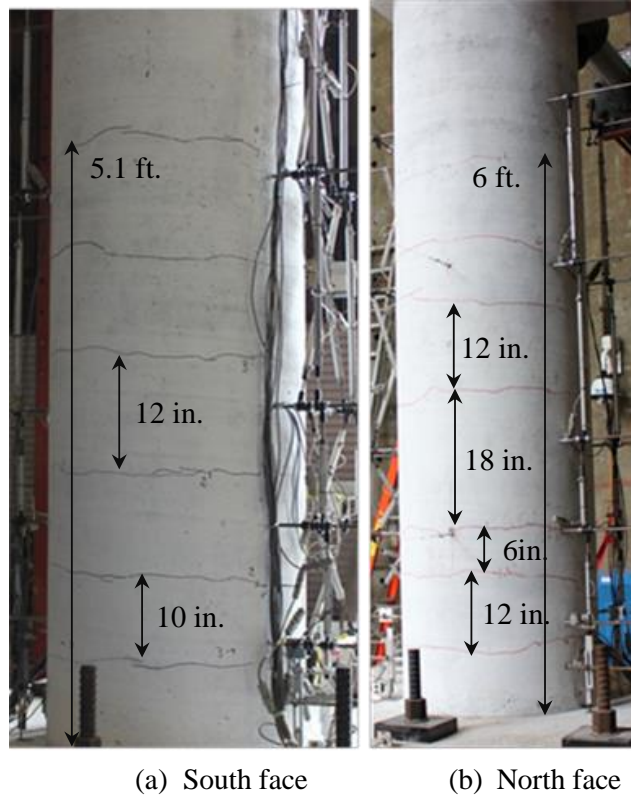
Flexural cracking in Specimen #1 at 1% drift
